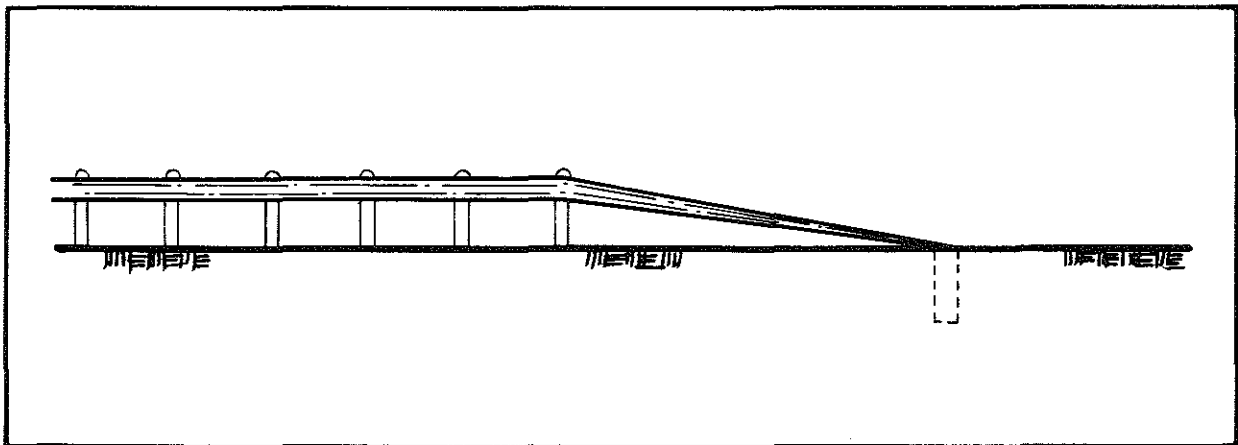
Texas twist (turned down) terminal for exposed guardrail end.
